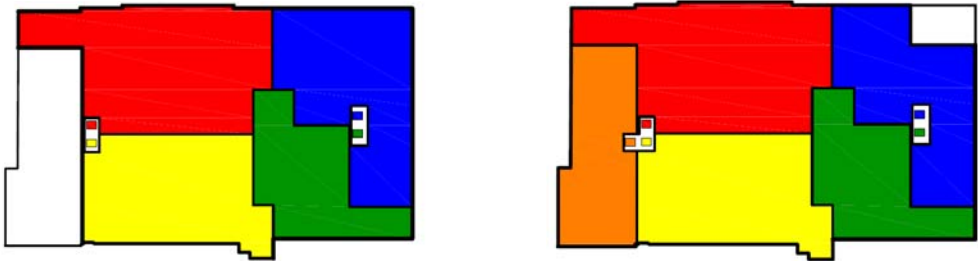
B Floor 2 and Floor 3 Existing AHU Layout.
